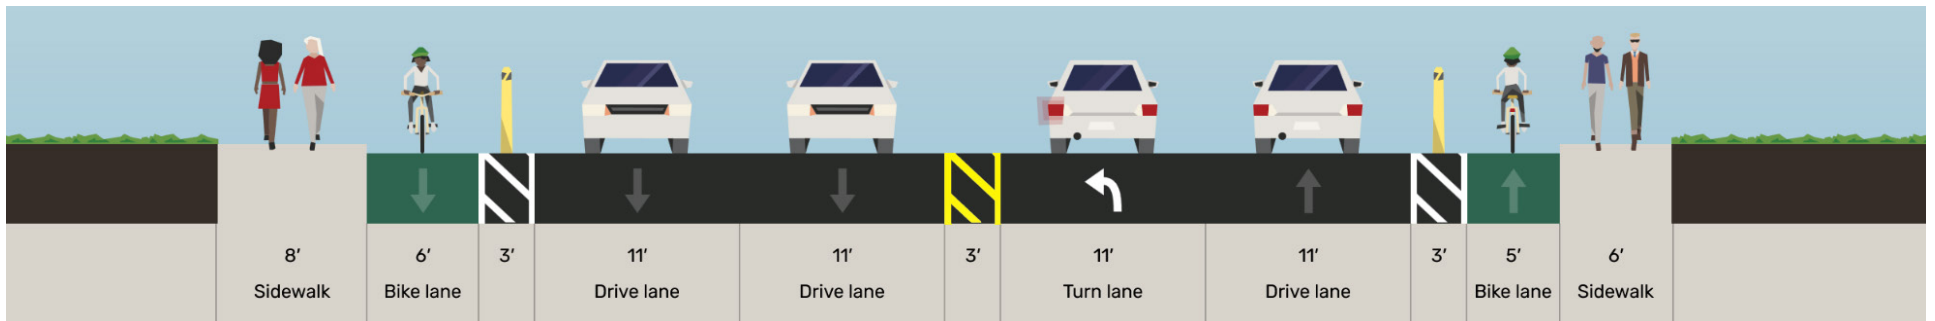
Proposed cross-section: Marine Ave from Aviation Blvd to I-405
